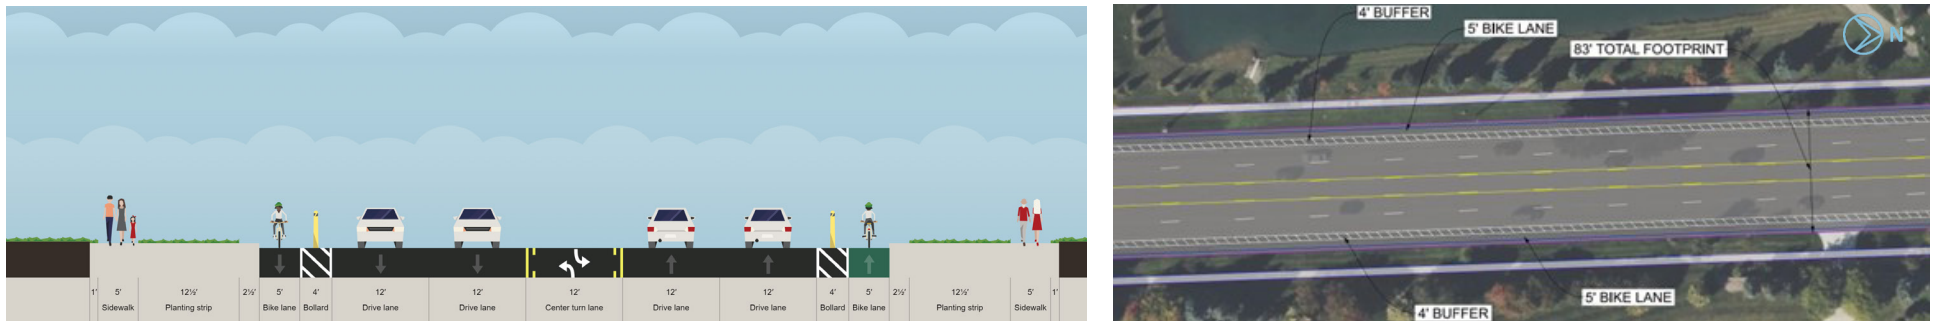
Alternative 6 Typical Cross-Section and Aerial View
